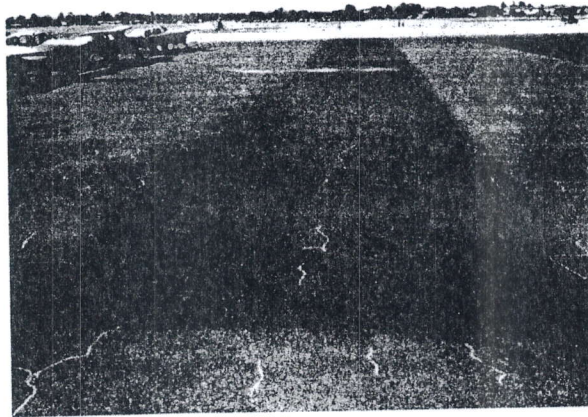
Meadows Field Test Section four months after treatment: absence of shrinkage cracking in treated areas; chalk outlines cracking still existing in surrounding treated area and in untreated area between passes.
